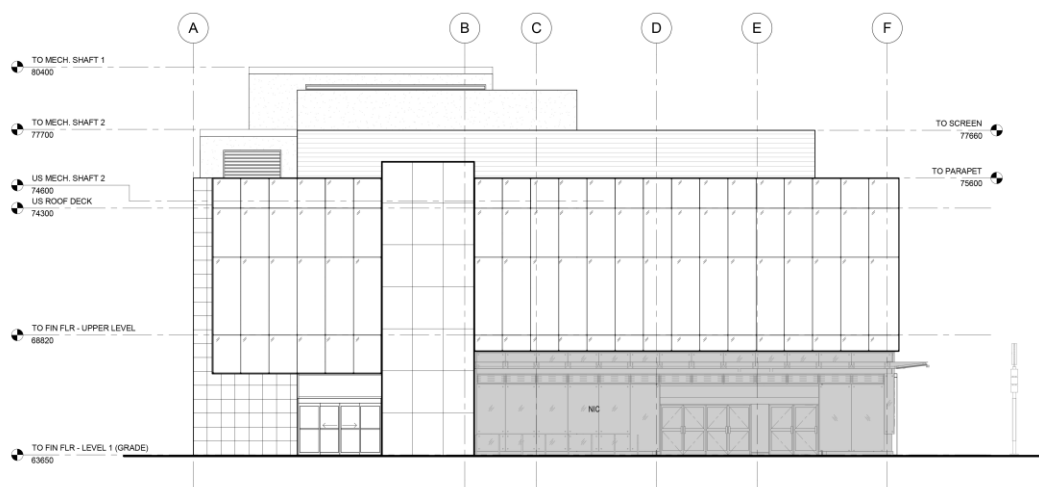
Rideau Street elevation (North Elevation) for proposed infill building at 117 Rideau St. (IBI Group, 2016)
